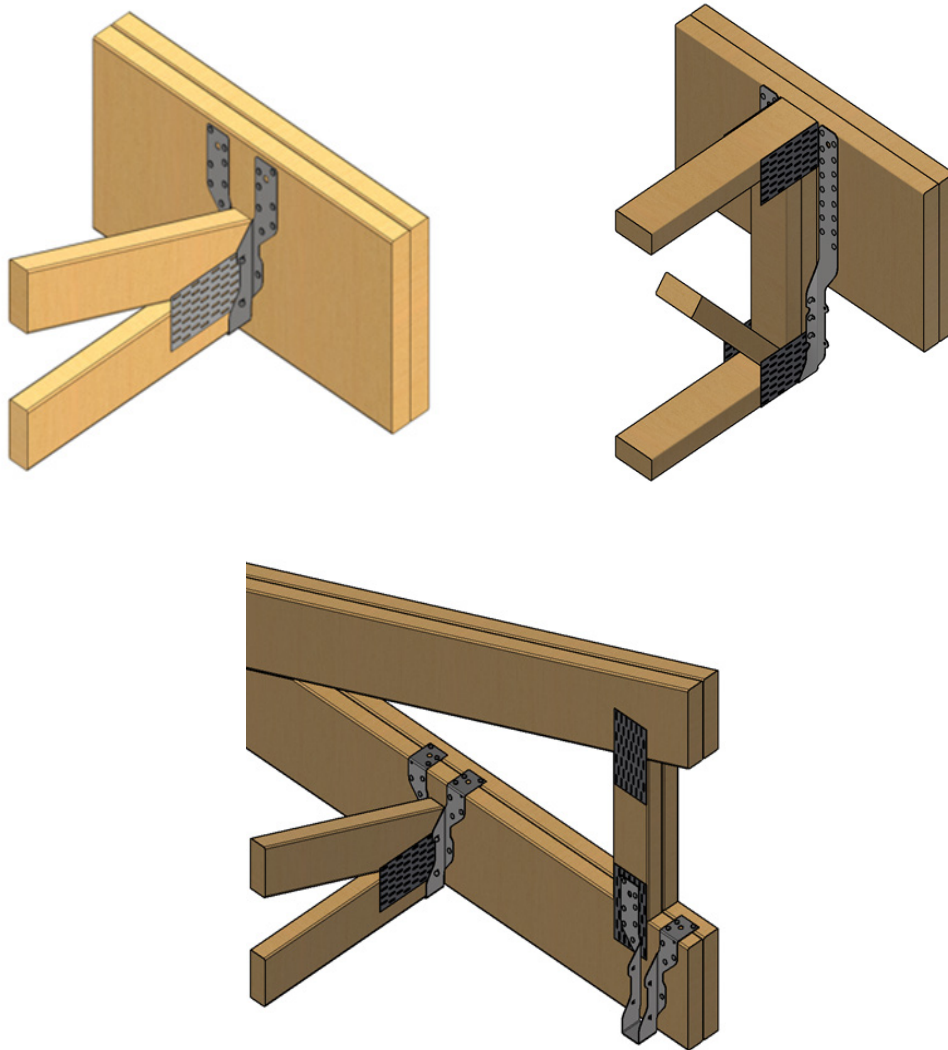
Installation View of Top and Face Mounted Flange (TSH) Hangers
